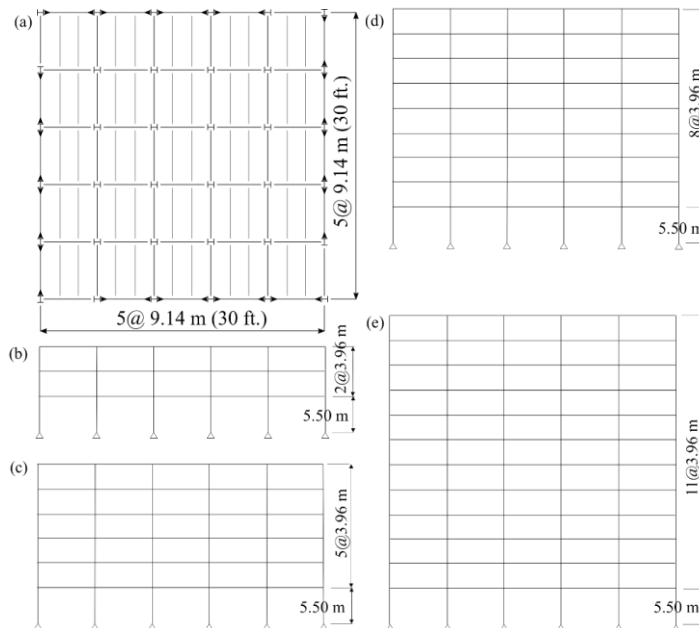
Steel gravity frames (a) plan and elevation of (b) 3-story, (c) 6-story, (d) 9-story, (e) 12-story
